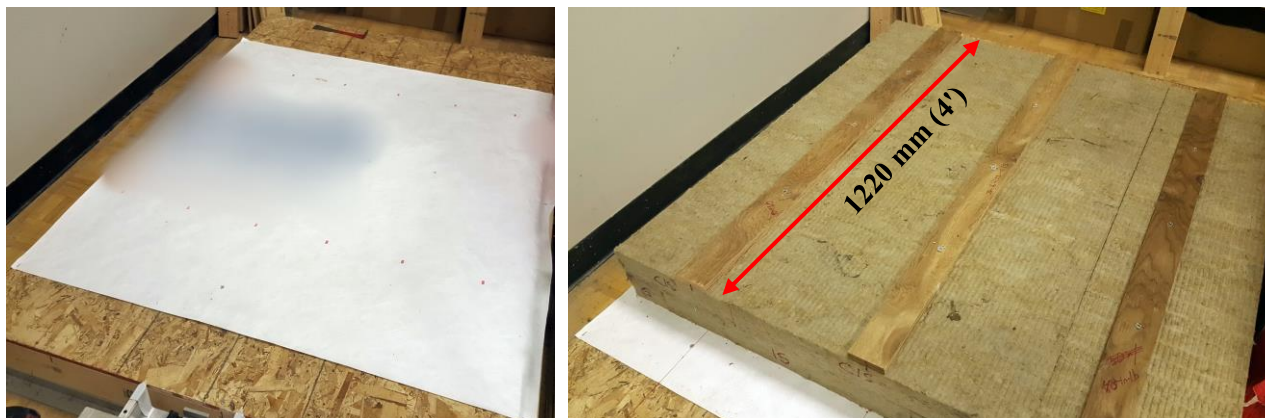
Backup wall framing sheathed with OSB and spunbonded polyolefin house wrap membrane stapled to OSB (left). 152 mm or 6" (2 layers) of mineral wool insulation with 19 mm x 76 mm (3/4"x3") plywood strapping at 406 mm (16") o.c. spacing (right). Note that each strap was secured with three screws at 300 mm (12") spacing.
